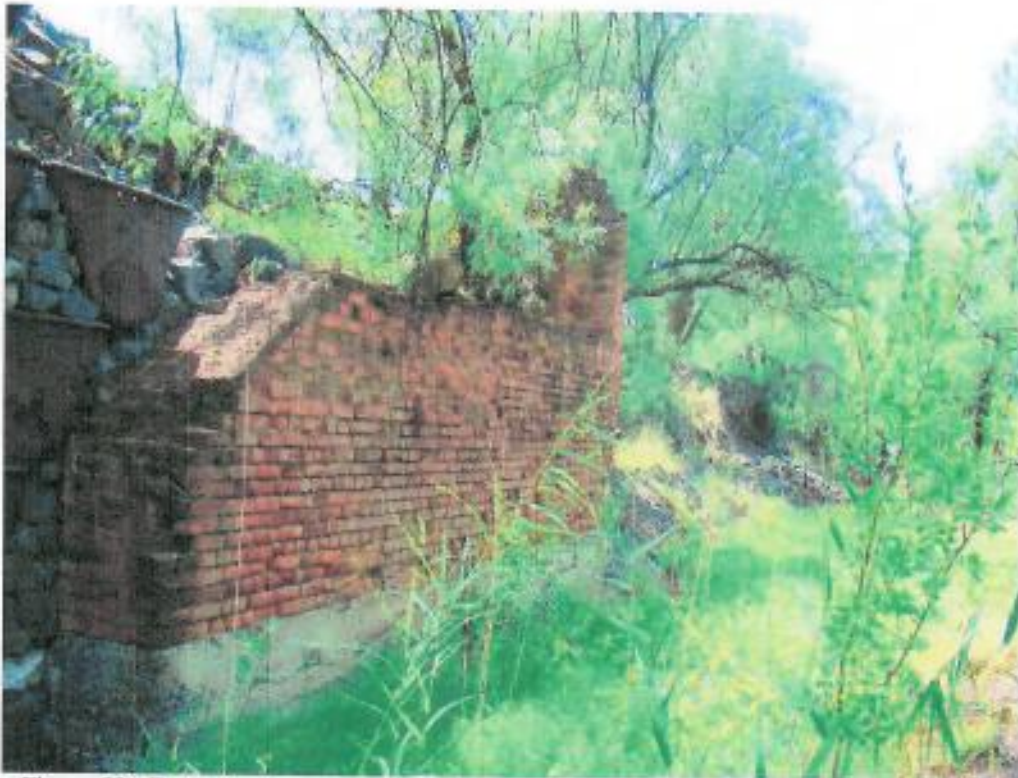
In the western section the wall has a small outcrop to form a bridge over the canal
